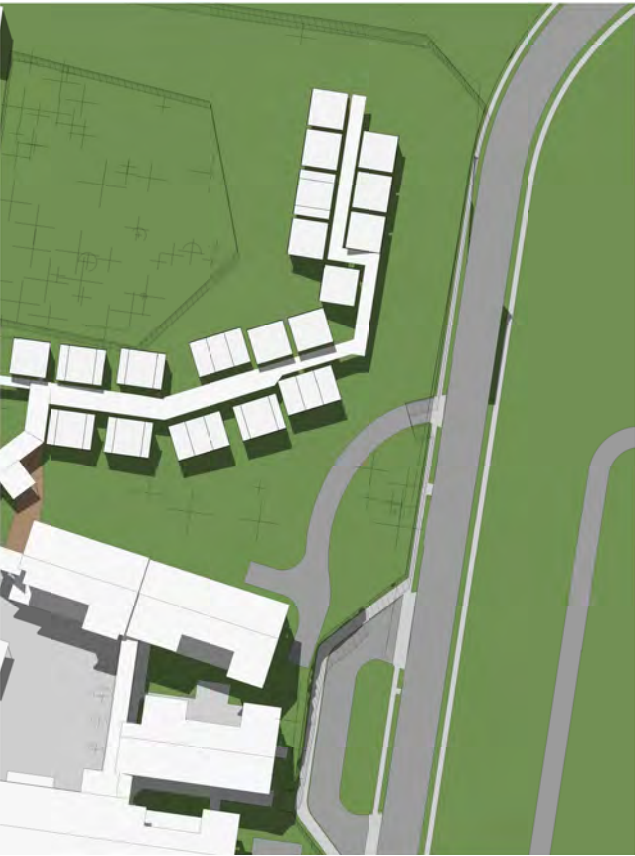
Site plan extract depicting the existing shadows at 1 pm
